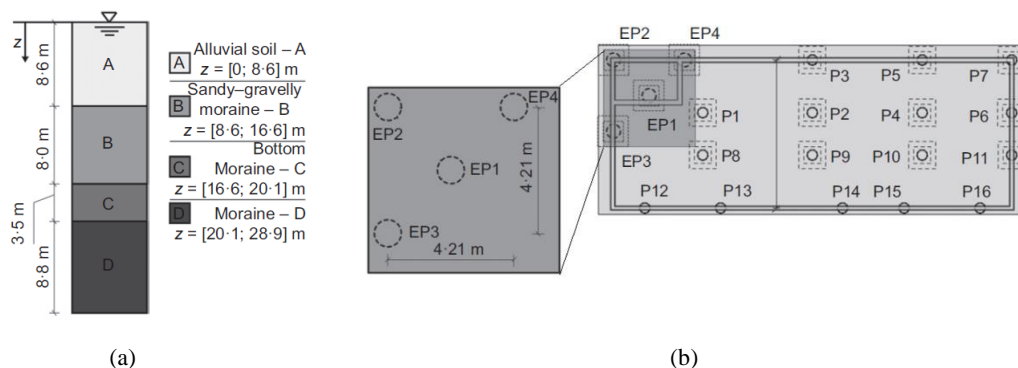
Group test at the EPFL: (a) soil properties and (b) energy pile group layout (after Rotta Loria and Laloui, 2017a).
